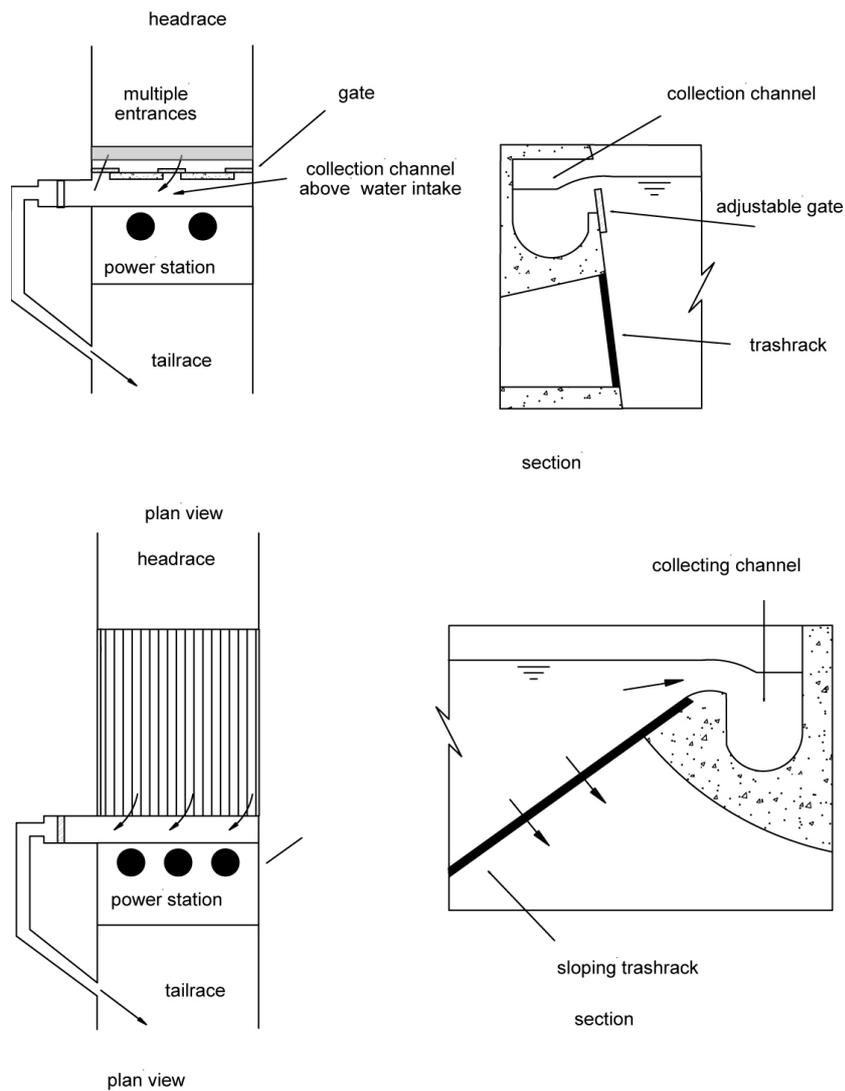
Conceptual plan and section of downstream bypasses at hydroelectric plant intakes.
